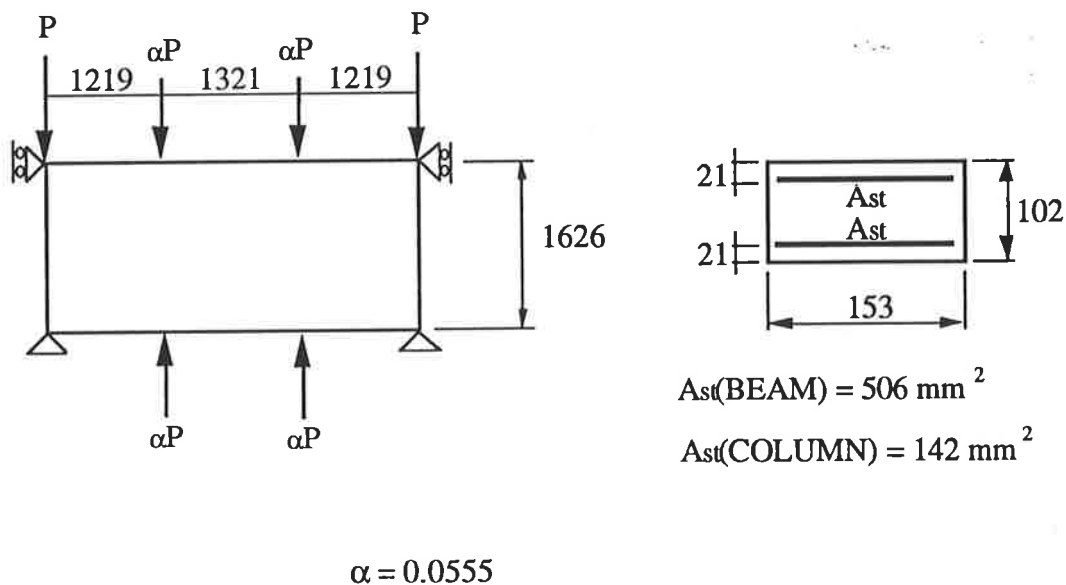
Test configuration and section details for frame F6 tested by Furlong (1963)
